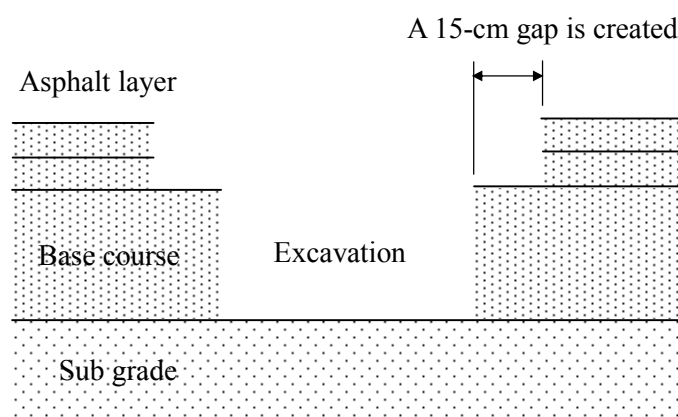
An indicative sample cross section of excavation in local replacement work
